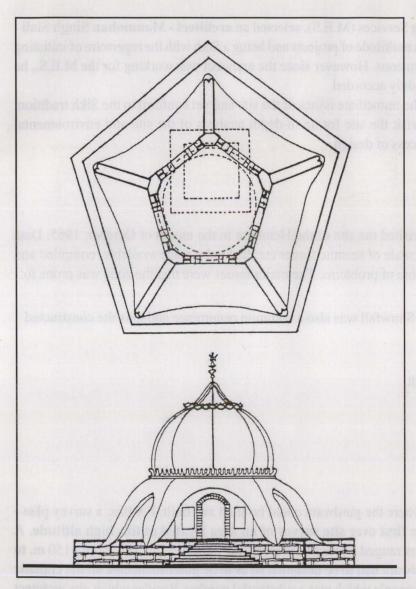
The plan and elevation of the design proposed by S. Beant Singh
